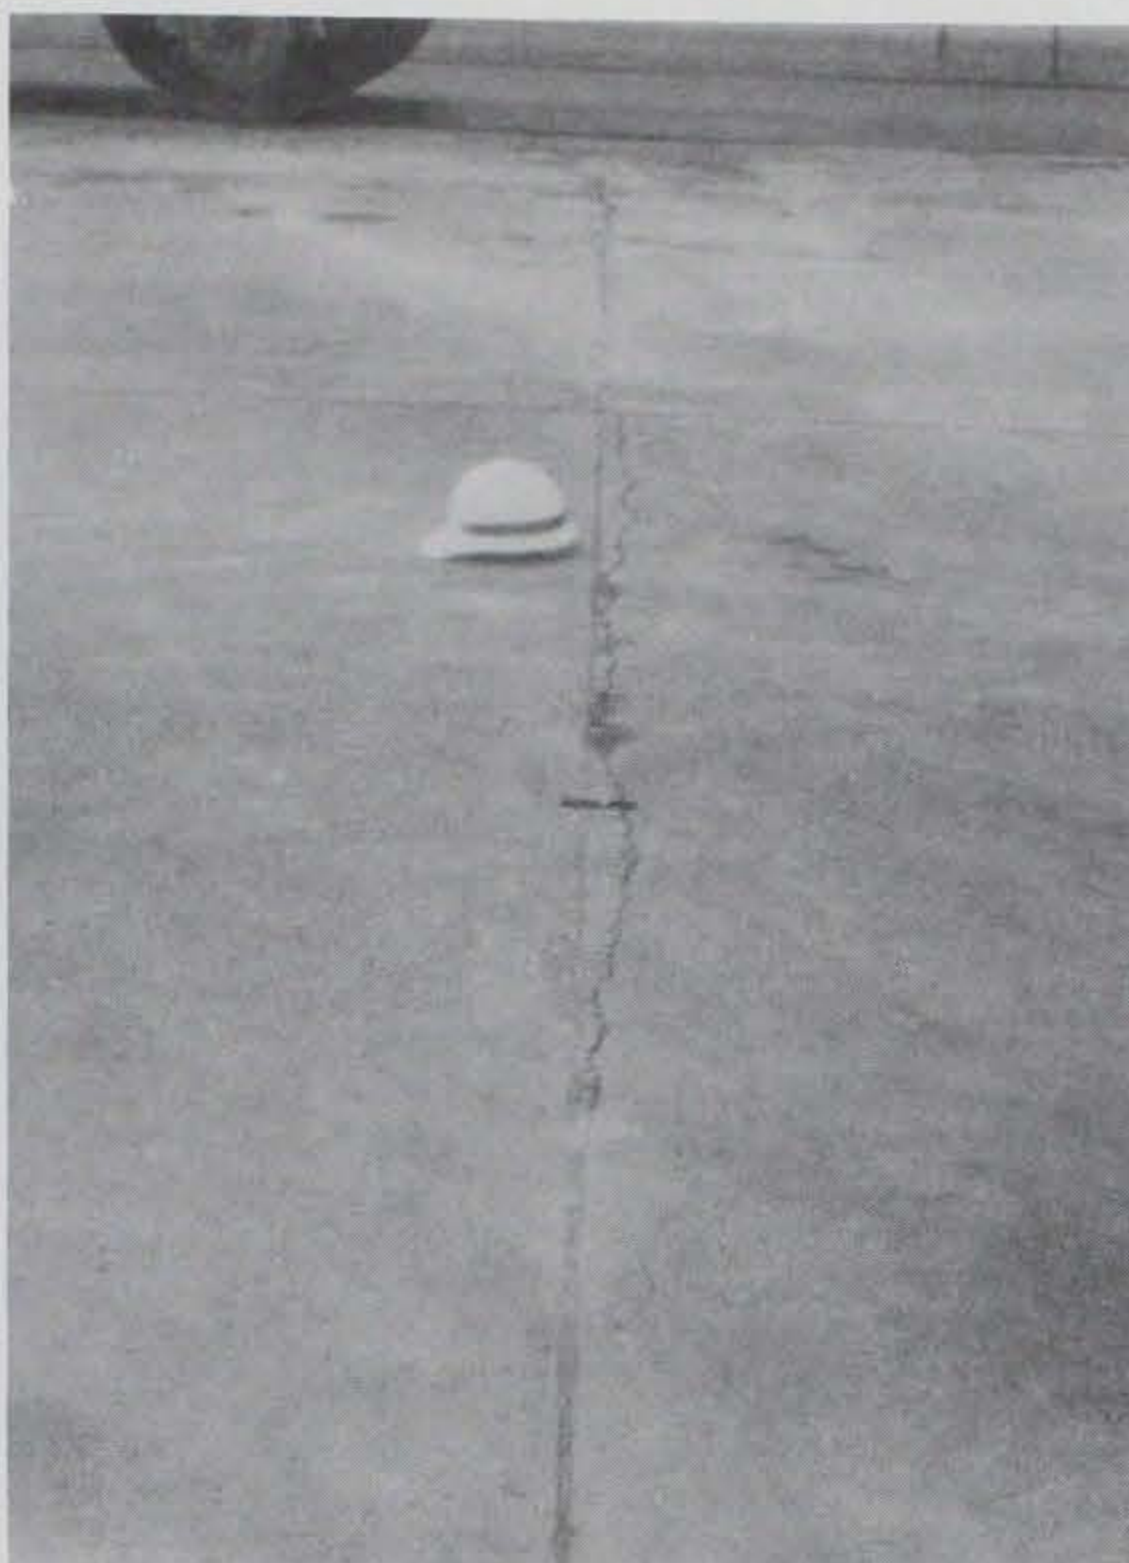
This crack formed ahead of the saw during cutting, indicating that the sawing occurred too late
